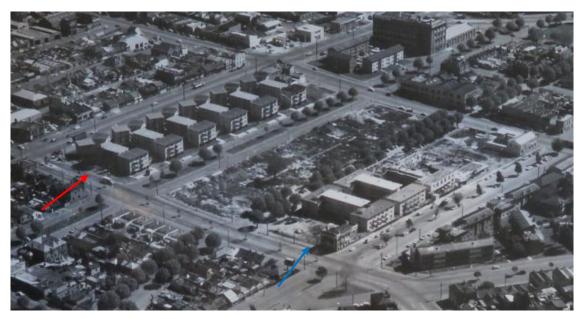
Oblique aerial view of Hotham Gardens development, c. 1962, looking south-west from the corner of Haines and Curzon streets to Arden Street. Stage 1 indicated by red arrow and Stage 2 (under construction) indicated by blue arrow
